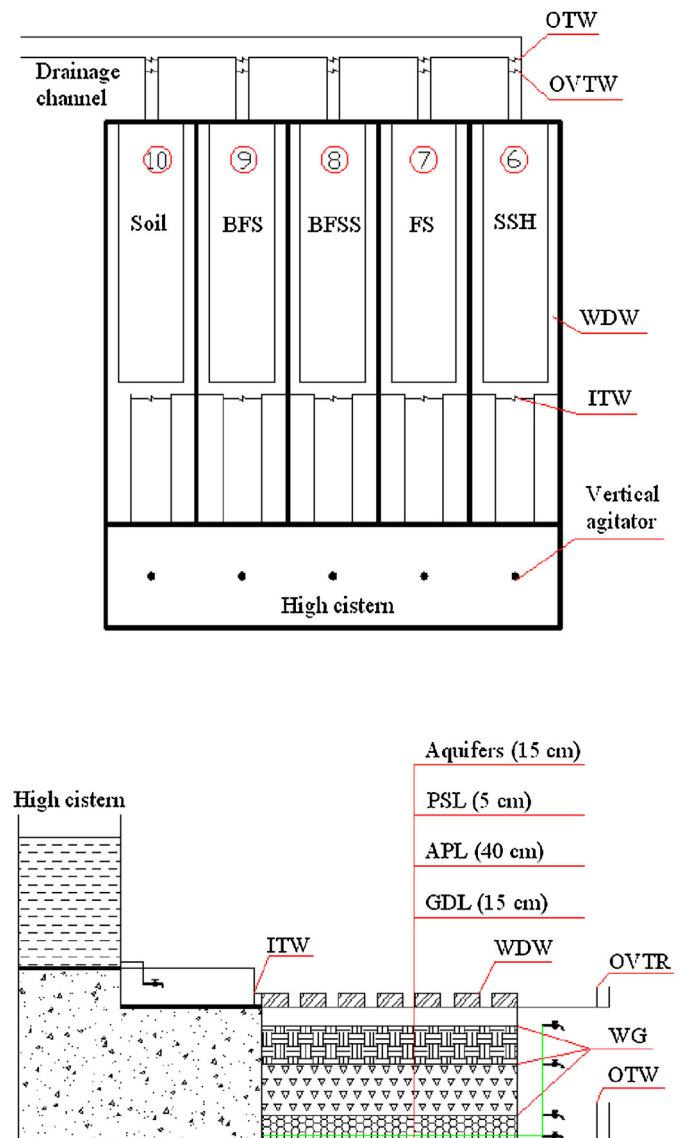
Floor and section plan of bioswale pilot plant (0.5 m wide). Construction includes an aquifer, covering layer and planting soil layer (PSL), artificial packing layer (APL), rice stone layer, and gravel drainage layer (GDL) from top to bottom in each bioswale. WDW for water distribution weir, ITW for inflow triangle weir, OTW for outflow triangle weir, OVTR for over triangle weir, WG for waterproof geotextile. Screened sizes of blast furnace slag, rice stones, and gravels are 0.6–1.5, 0.3–0.6, and 1.5–3 cm, respectively.
